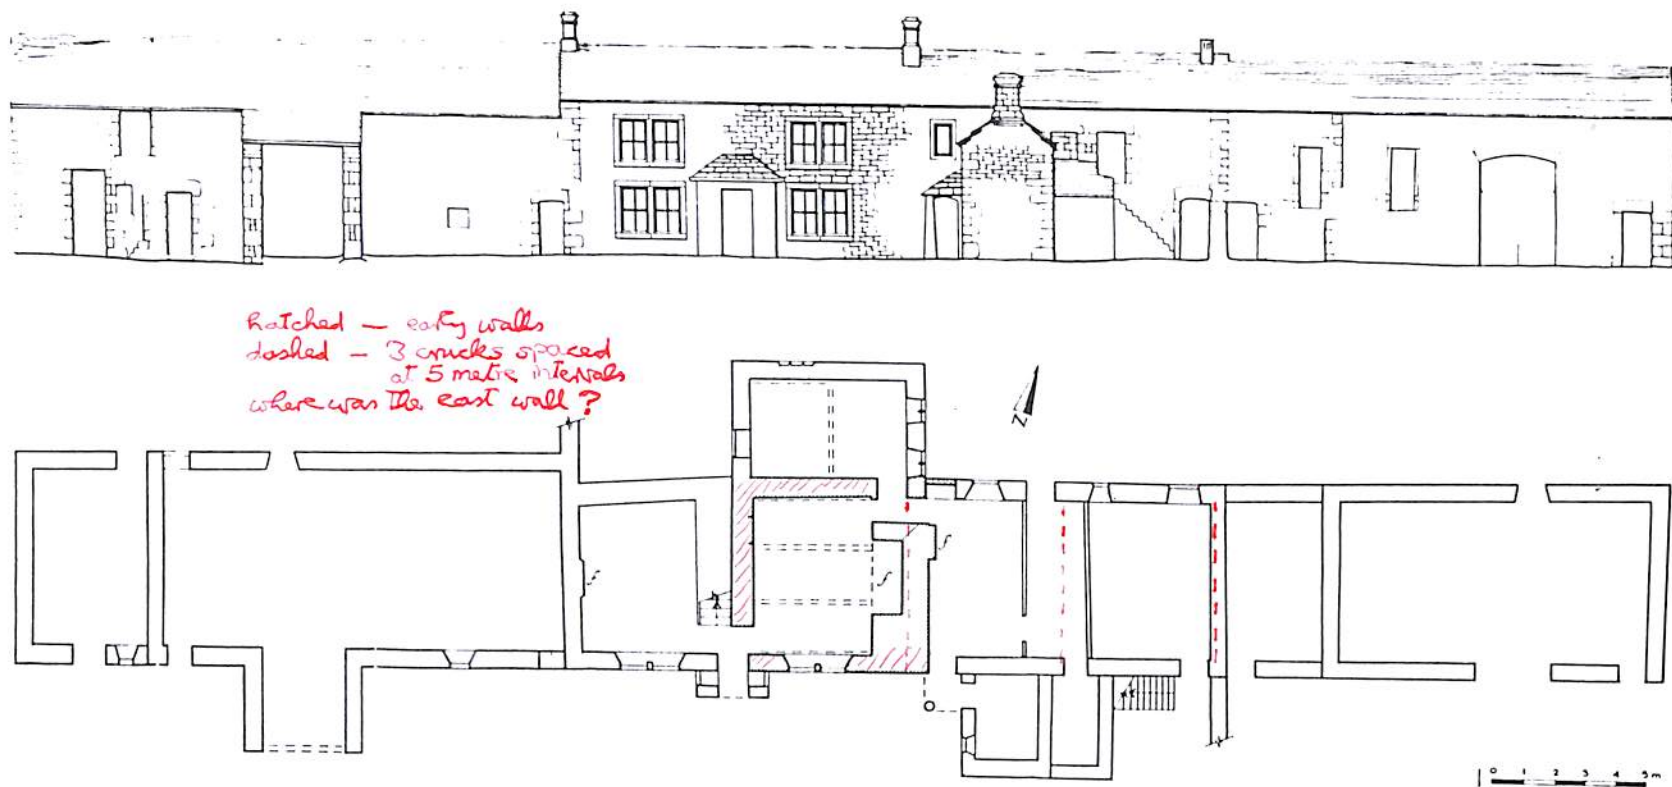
Cracoe, Coxon's Farm, 1669 [553]. Stone house in Craven, earliest part corresponding in length to 16th century description. Passage with rear door now removed, stone-arched fireplace; added rear service wing and 55 m long range of outbuildings, perhaps incorporating a second dwelling on east side of passage at some stage. Crucks re-used as principals in passage roof and as barn lintel.
